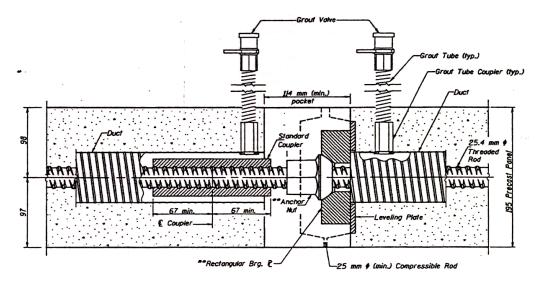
Post-tensioning detail used on Bridge-4 constructed on Route 75, Sangamon County, Illinois
